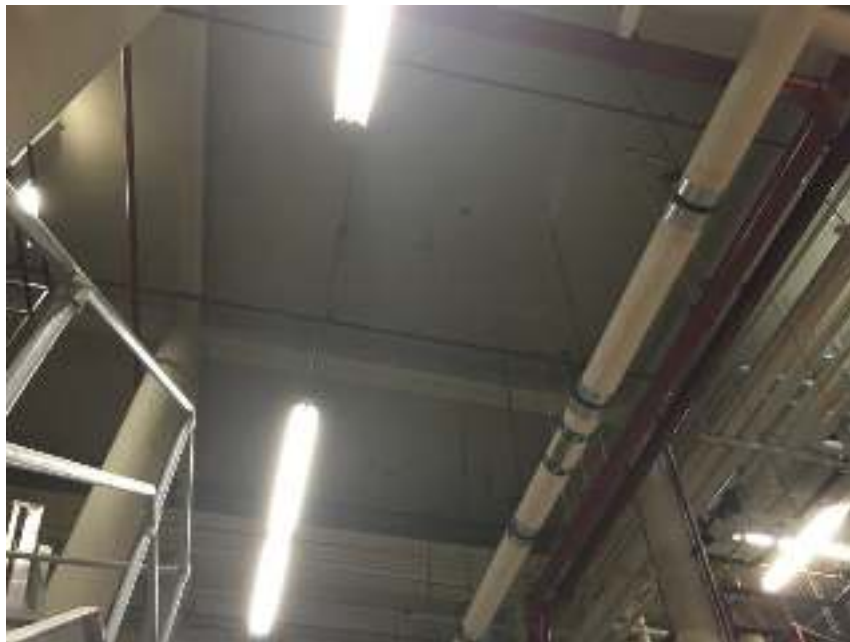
Cementitious parge layer throughout sub-basement mechanical room ceiling (Room 003) was confirmed to not contain asbestos. Visually homogenous cementitious parging layer was observed throughout the ceiling/deck of select areas of the basement and sub-basement and thus not considered asbestos-containing based on available bulk sample data.
